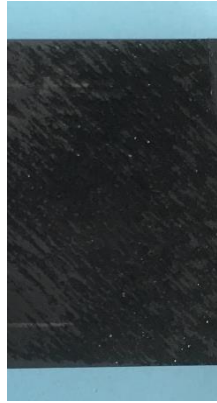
Failure pattern of edgewise compression test specimen (CT1)
